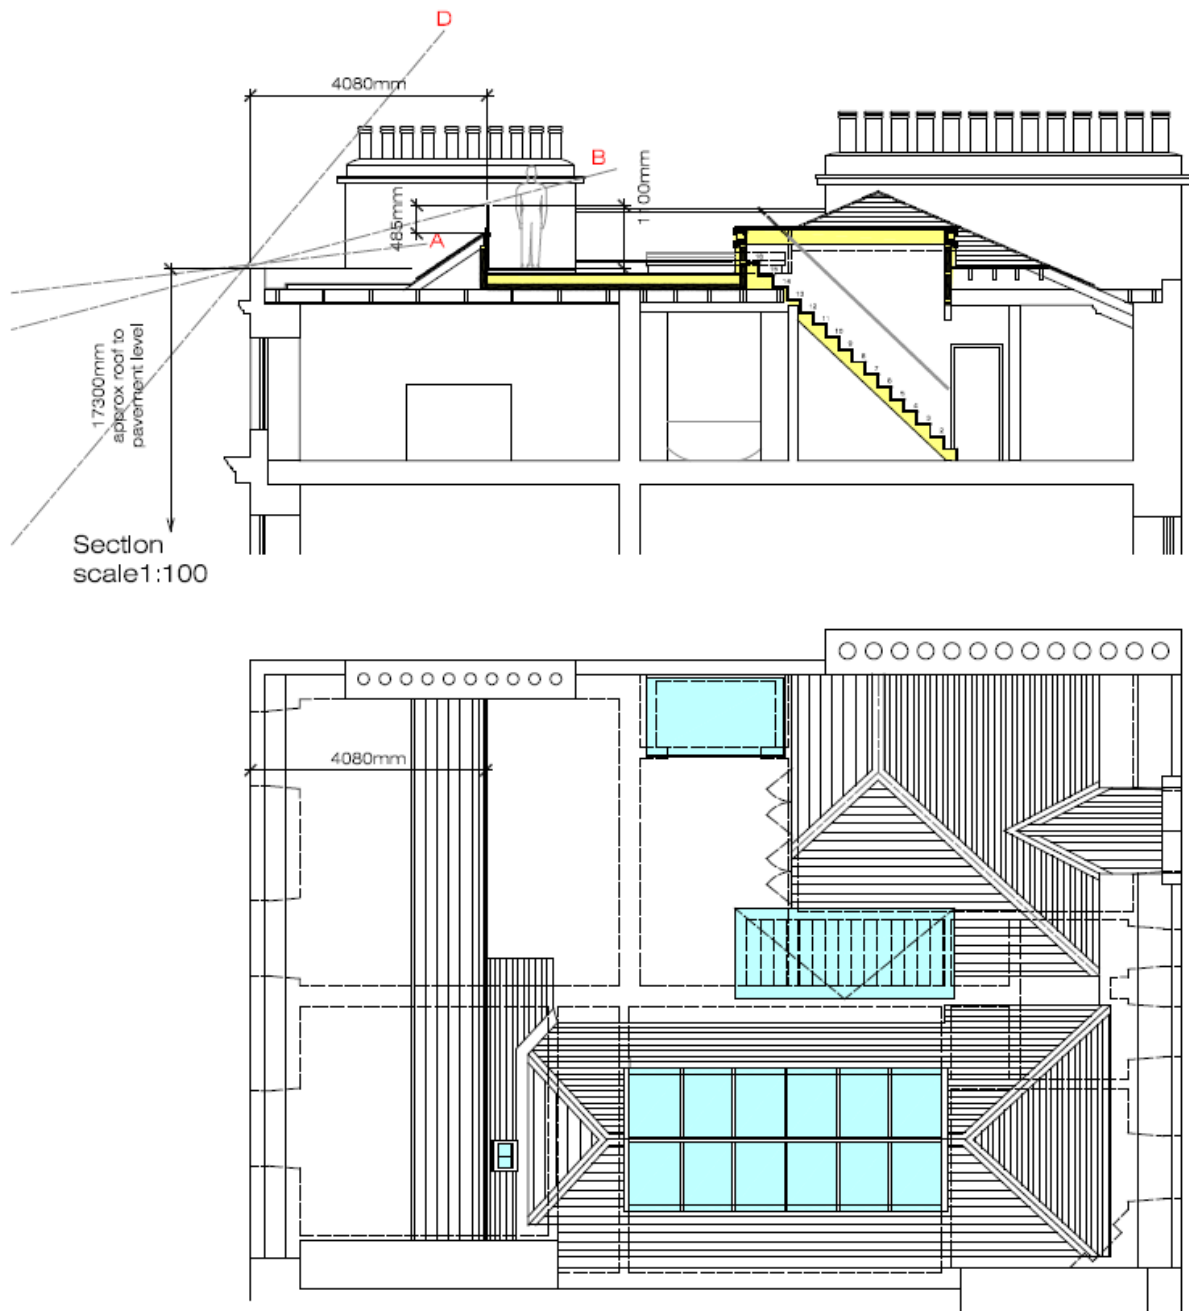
Proposed Roof Plan and Sections outlining distance from façade.
